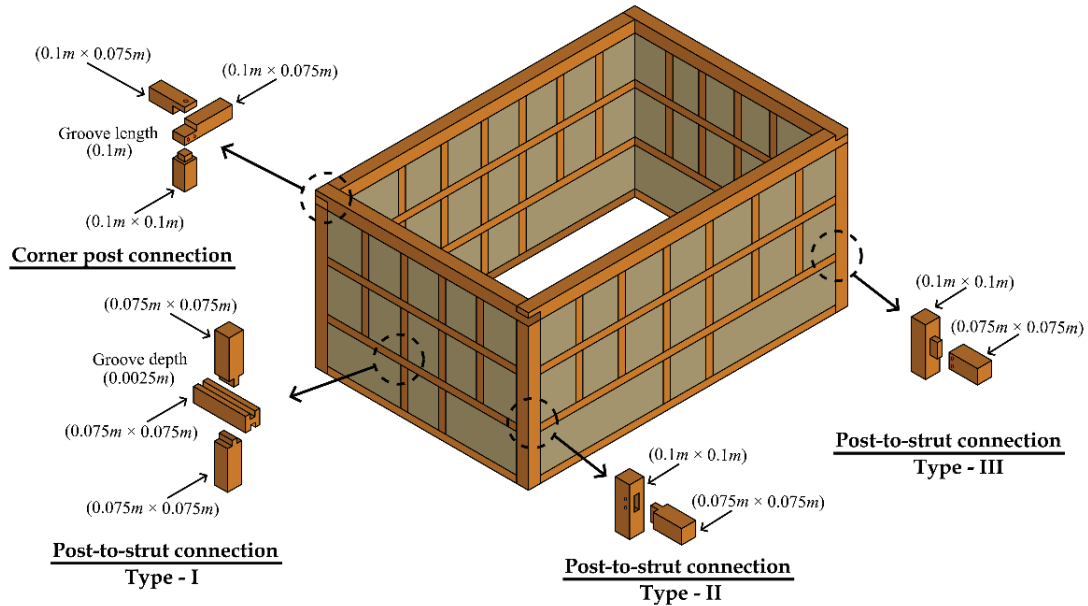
Typical sketch of timber framing and its connections in Assam-type buildings
